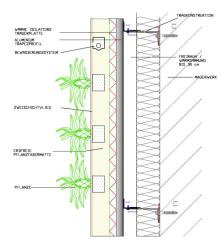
Box system attached to a wall by an aluminum substructure and wall brackets [1]
